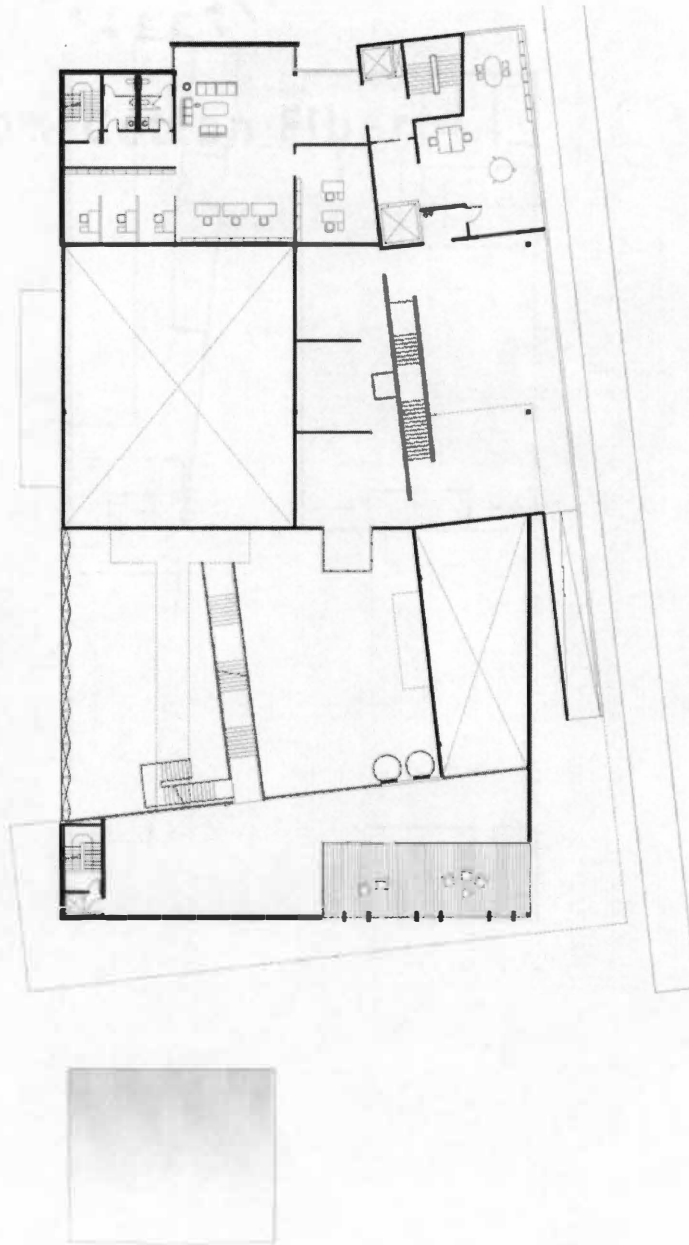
2<sup>nd</sup> Floor Plan Source: Author
